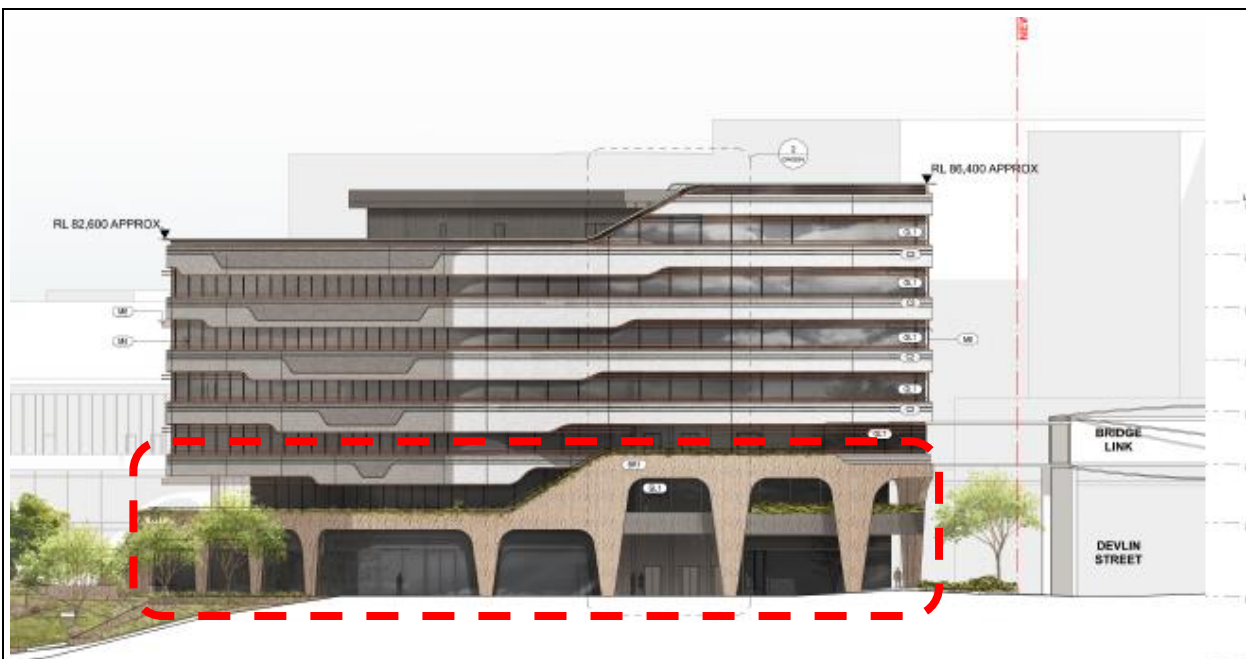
Southern elevation of the proposed civic building, illustrating colonnade feature
